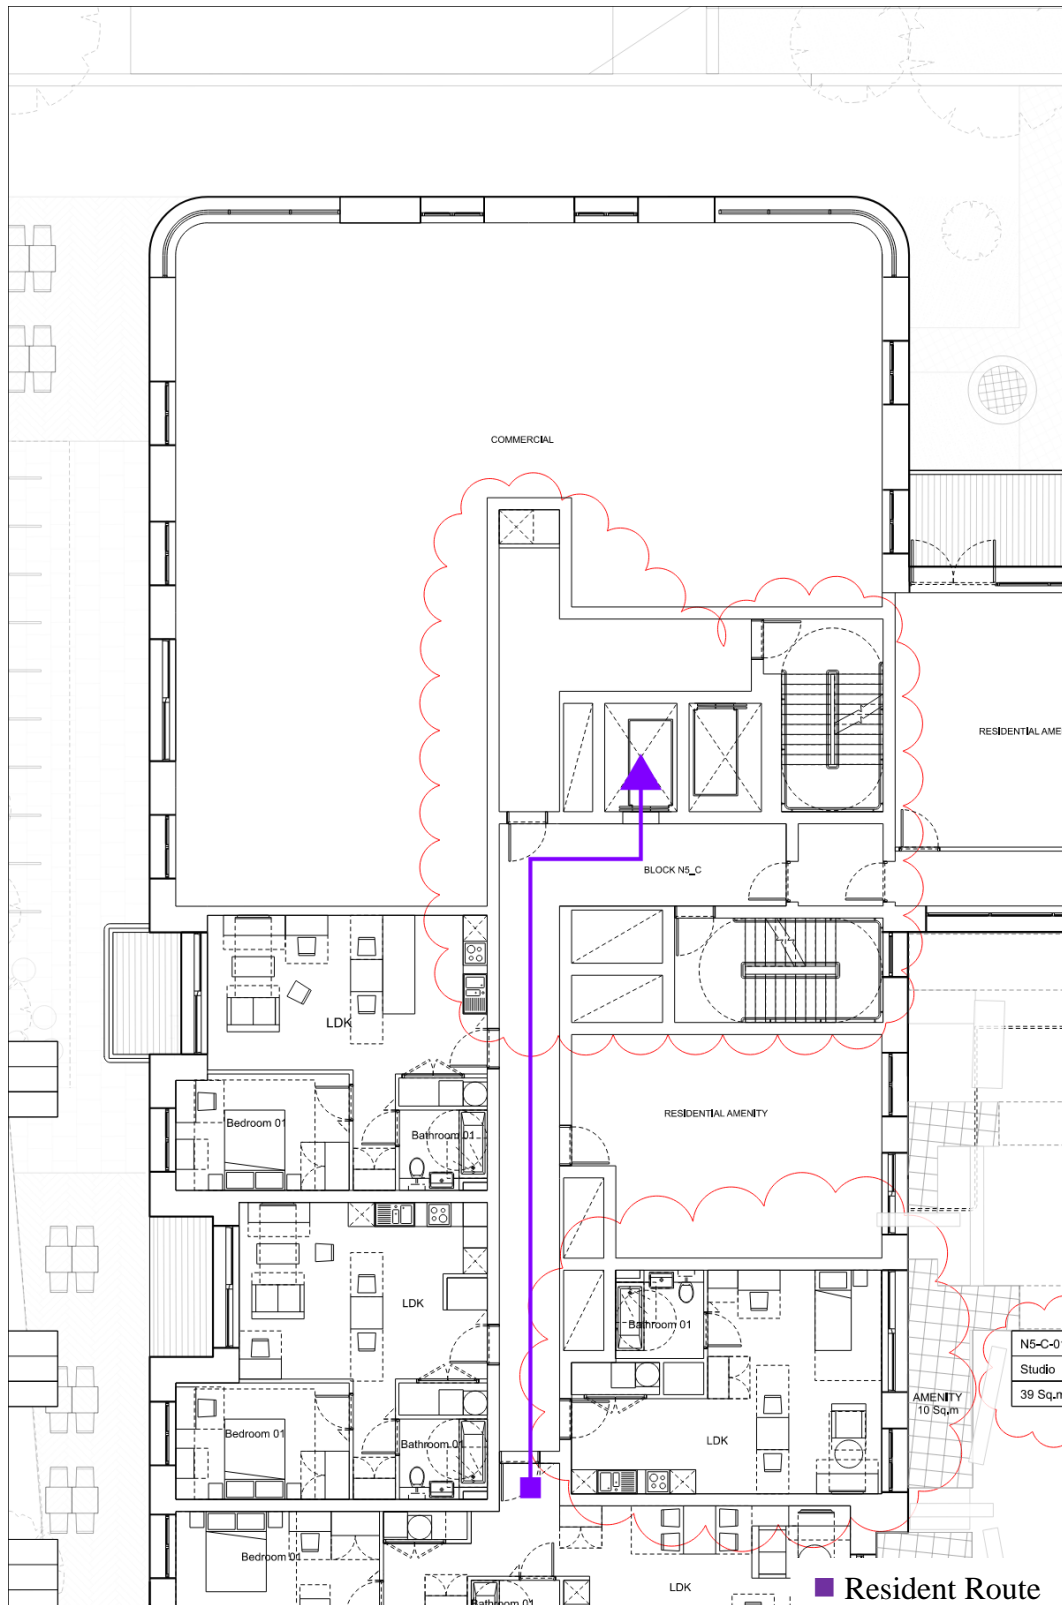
Longest residential waste conveyance route N5-C (typical upper floor)
